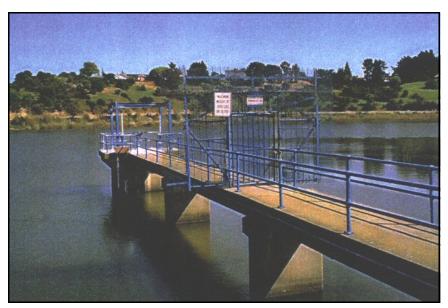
A footbridge or access bridge is often required to operate gates or valves located at the intake tower.
